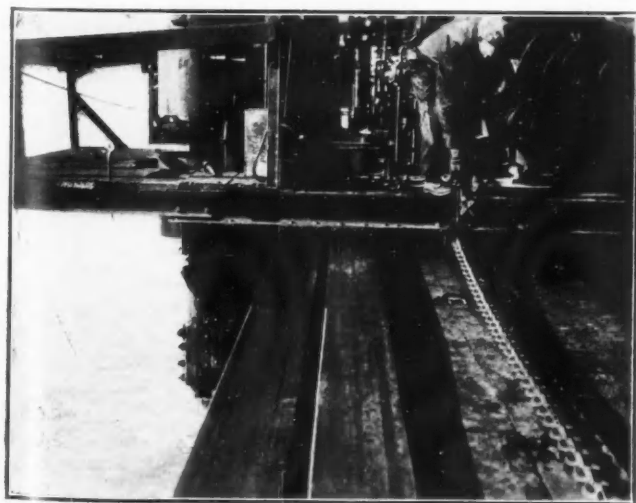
Showing Base of Drill Derrick, Track on which it moved and Endless Chain for shifting it.
